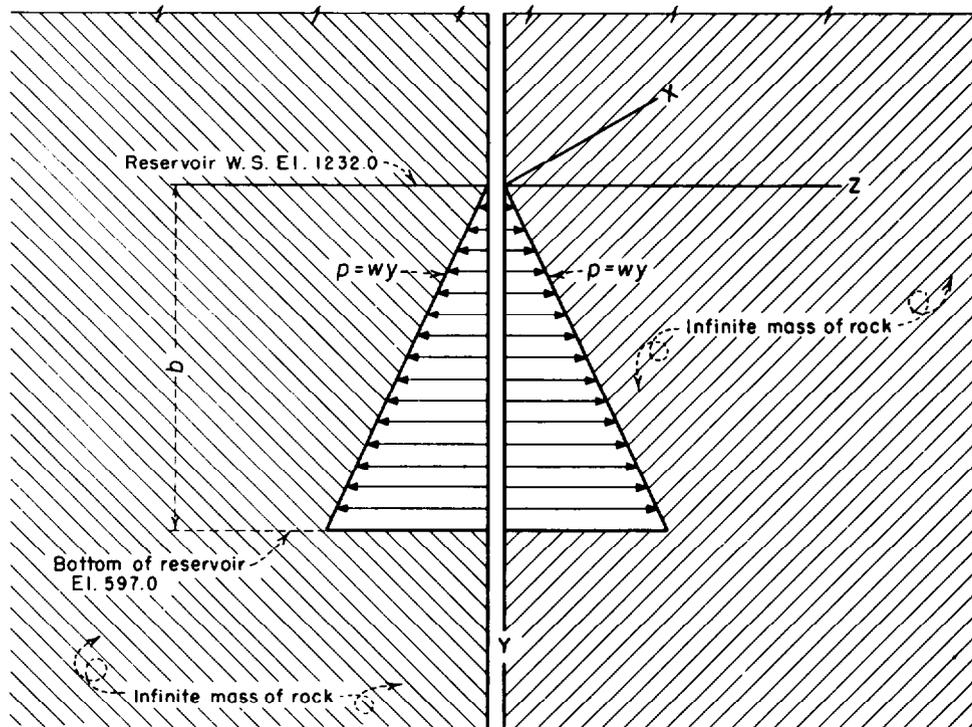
Hoover Dam studies—canyon with vertical walls in infinite rock formations.—DS2-1(285)
